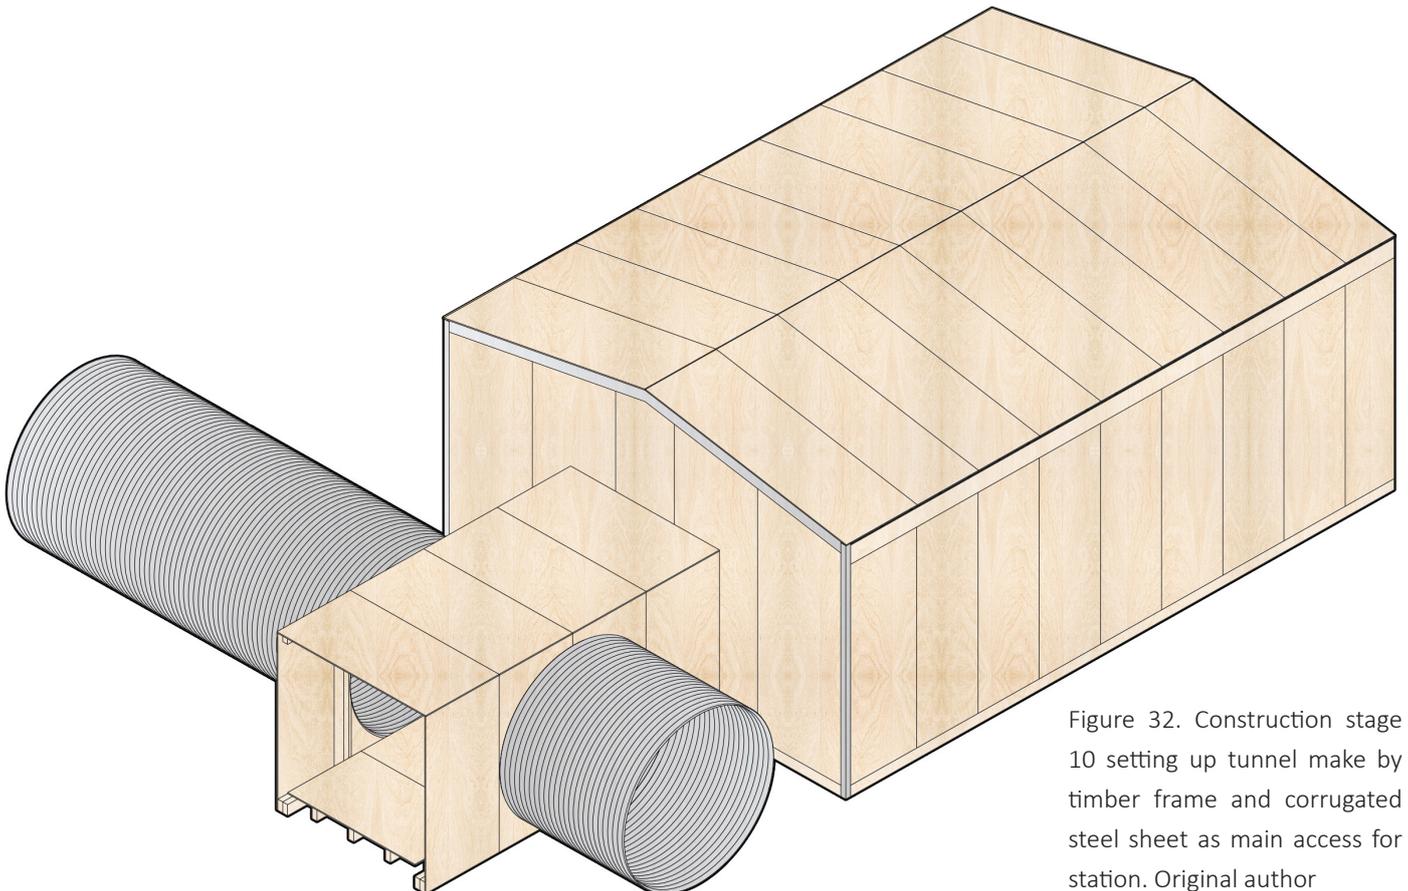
Construction stage 10 setting up tunnel make by timber frame and corrugated steel sheet as main access for station. Original author
